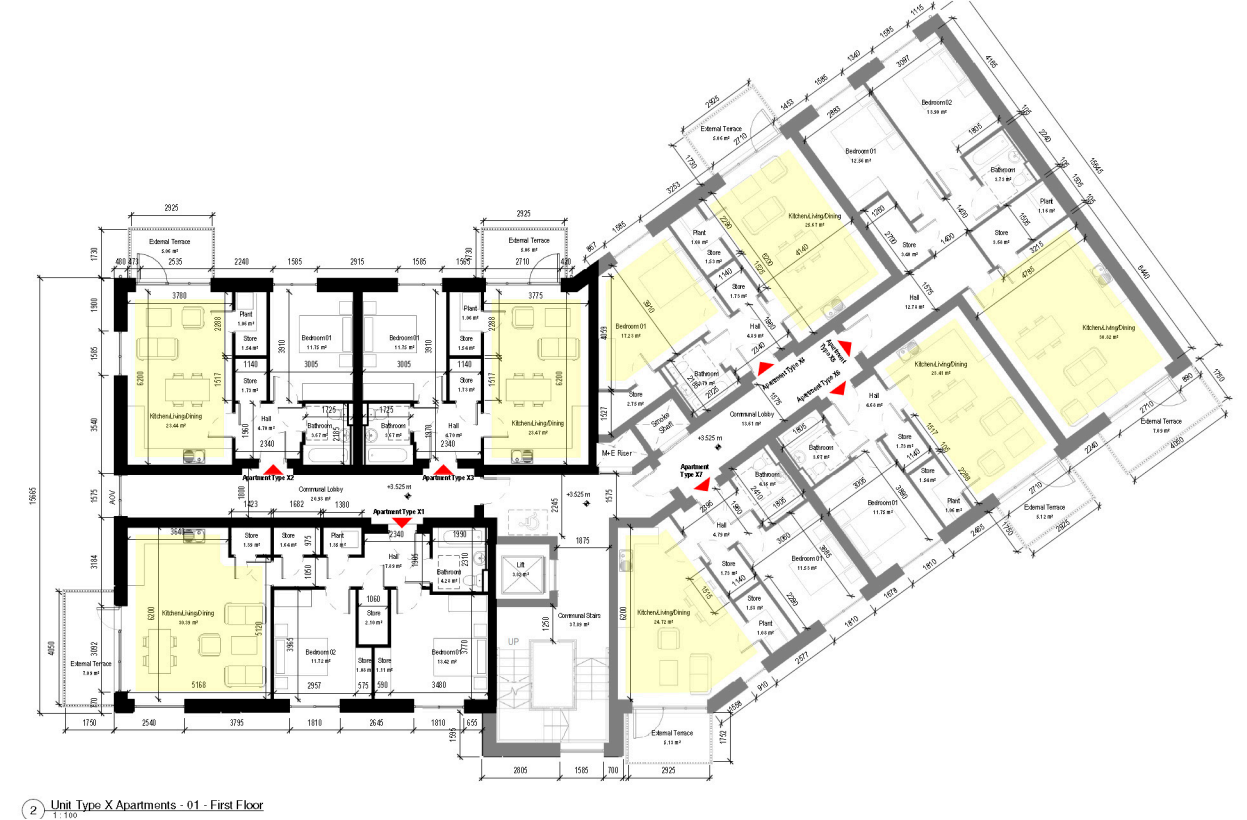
Indicative diagram based on floor plan prepared by Coady Architects showing extent of sample rooms (in yellow) analysed as part of the detailed assessment of daylight access within the proposed development (Section 4.2) - typical X Type Units – annotated in yellow by ARC. Please refer to Figure 4.1 for location of sample rooms within the overall proposal.
